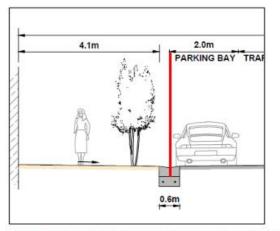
Proposed parking layout proximity of parking to dish channel and and landscaping
